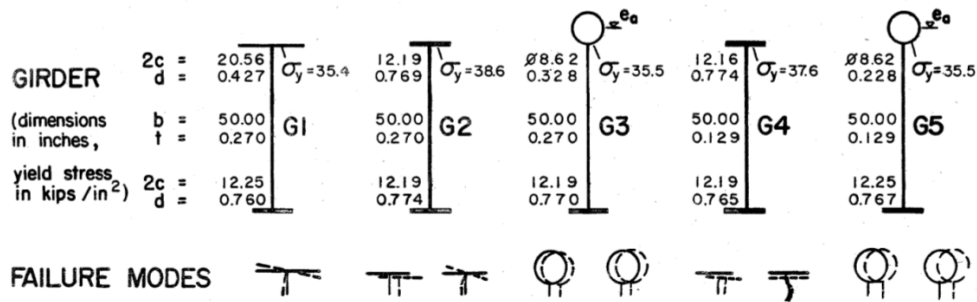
Overview by Basler [12] of test specimens G1 to G5 under bending
